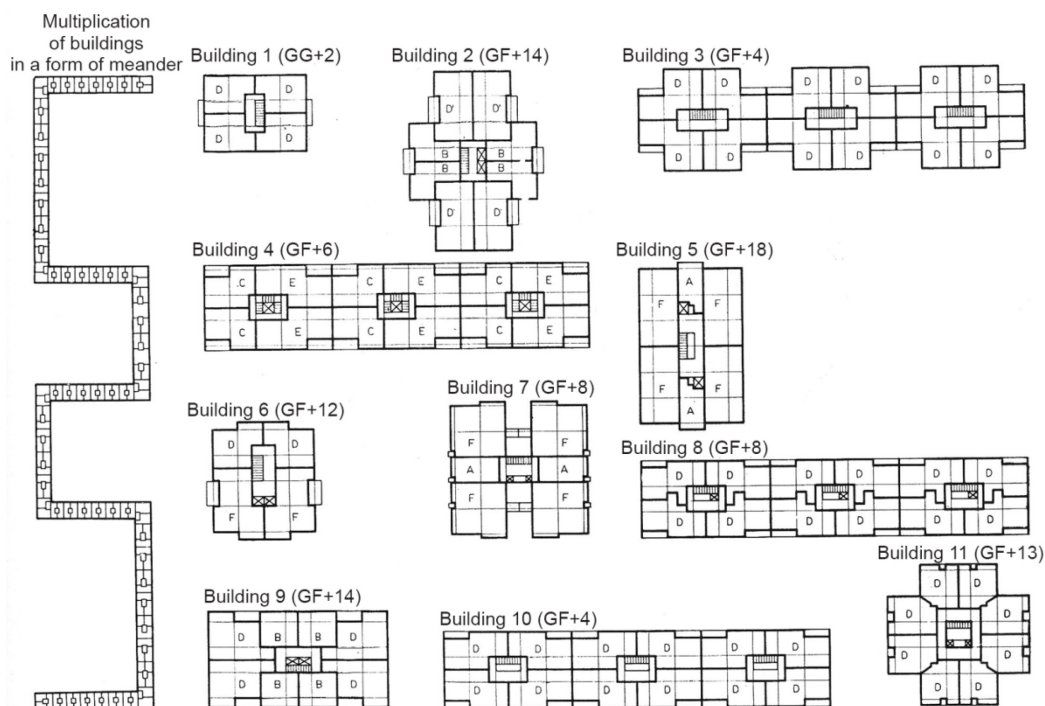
Schematic floor plans of various buildings constructed in the IMS prefabricated system
